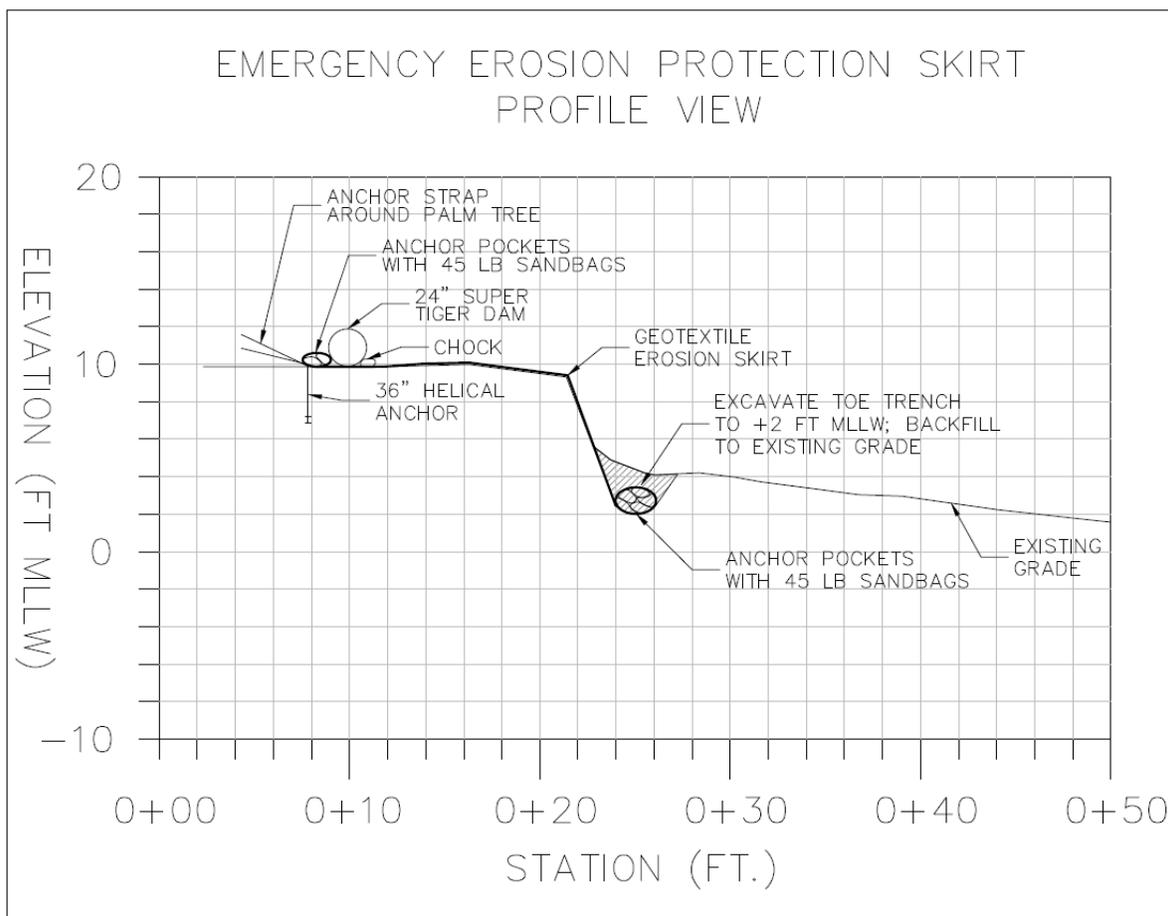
Section view of Emergency Erosion Protection Skirt deployment plan
